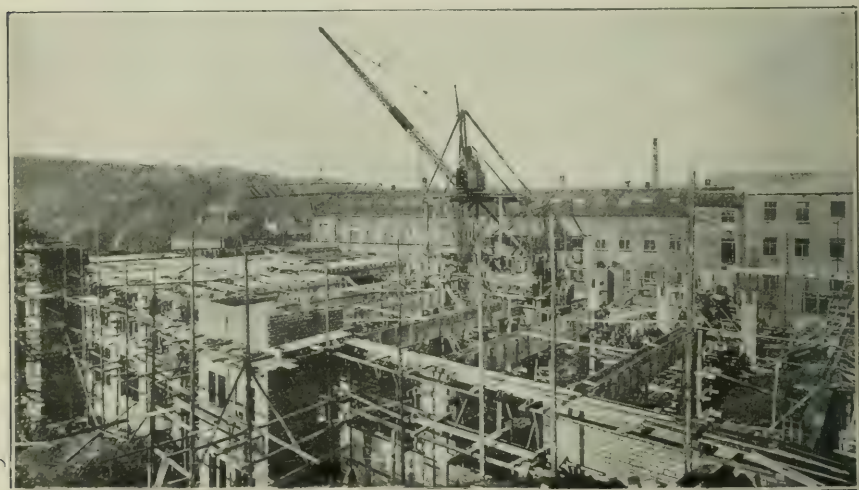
Warehouse, Bailiffe Bridge, in course of construction.
